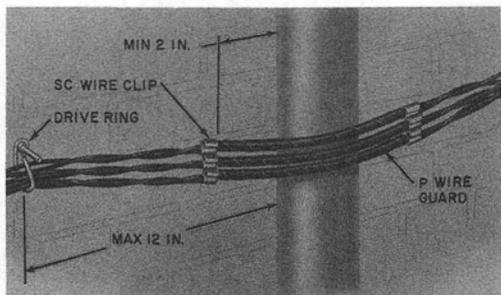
Wires Crossing Downspout on Masonry or Brick Surface
